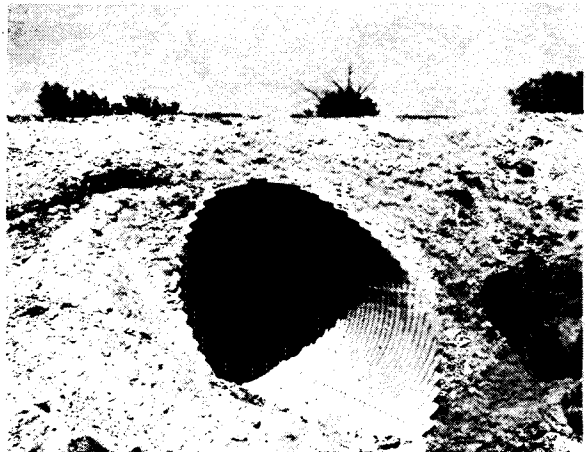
Corrugated-metal pipe used for road crossing. P-796-701-1548
